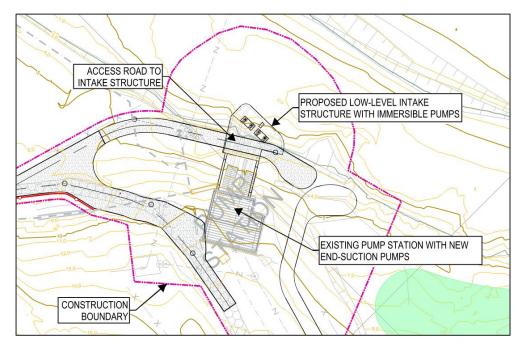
Preliminary Pump Station Layout (2014 – 2016)
